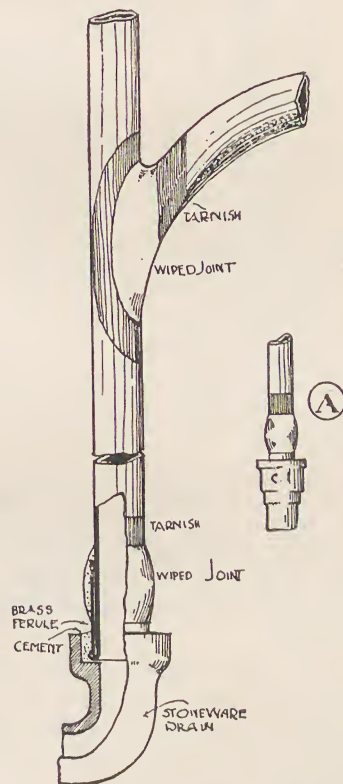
Method of jointing lead pipe to stoneware drain.
